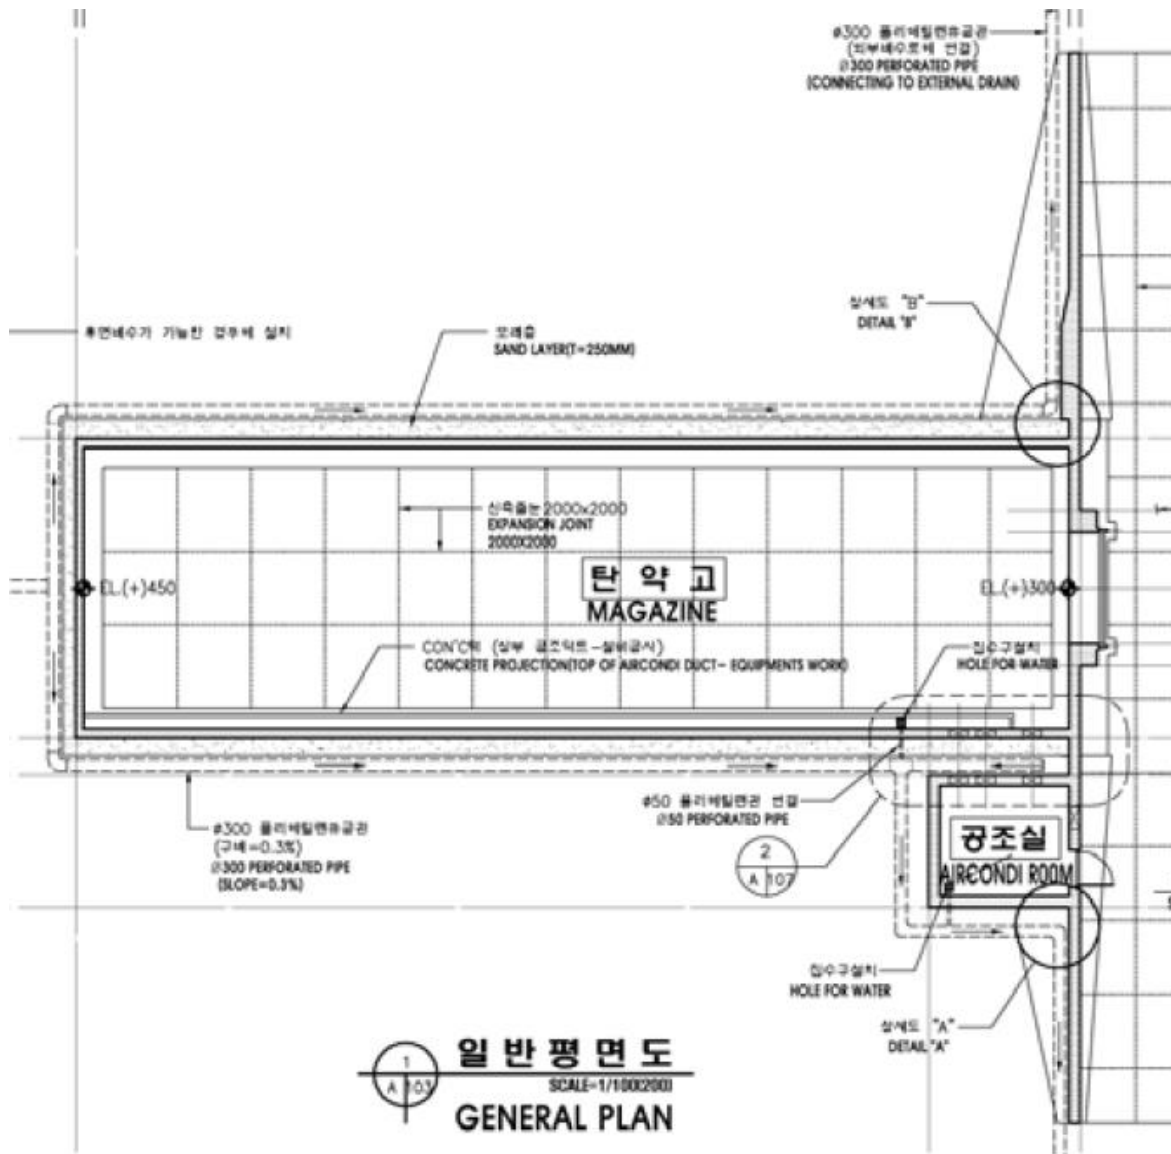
Floor Plan of Korean 33-15-74 with HVAC room option
